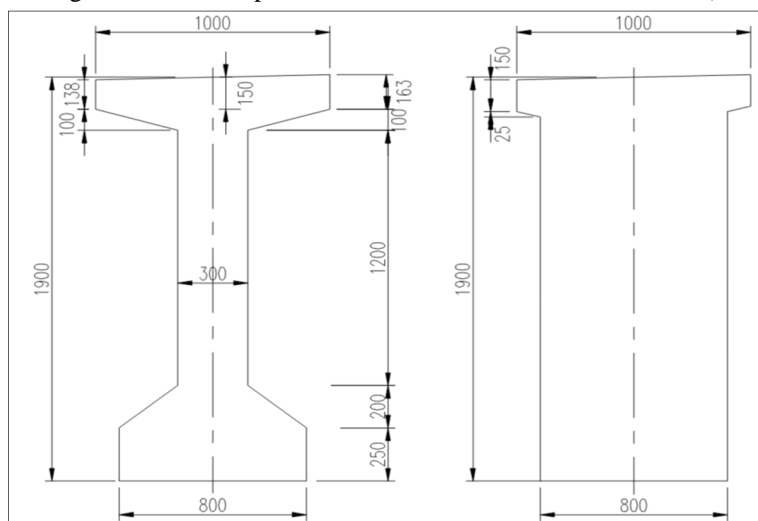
Precast Girder Geometry; At midspan (L), At Support (R)
